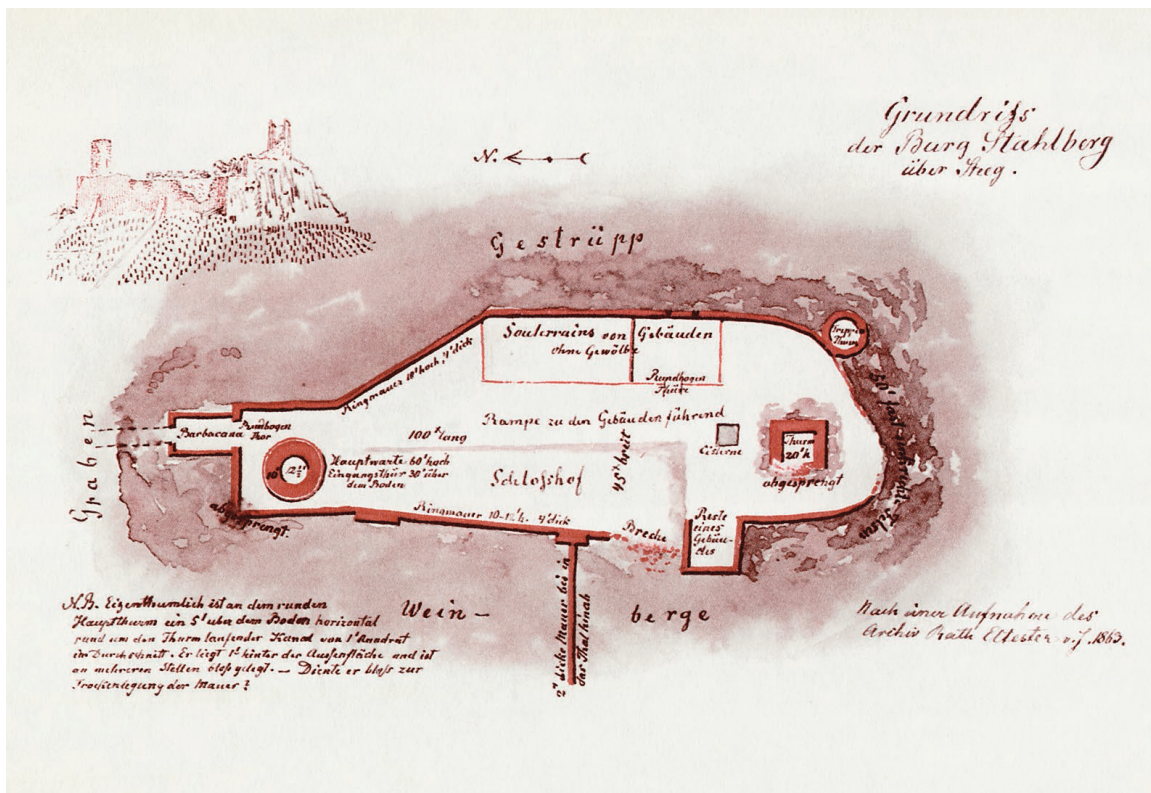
Castle Stahlberg, plan from Leopold von Eltester, 1863.
